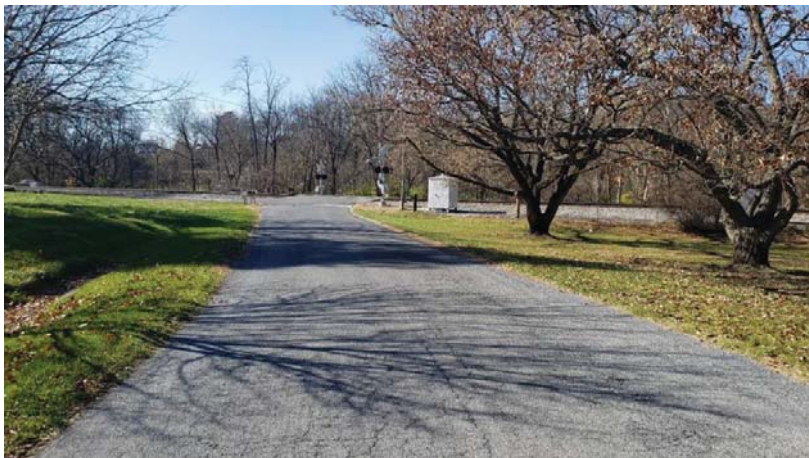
Glade Creek Road Westbound Prior to Railroad Crossing
